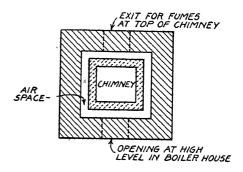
METHOD OF PROVIDING FOR VENTILATION OF BOILER HOUSE WHEN NEW CHIMNEY IS BEING BUILT
